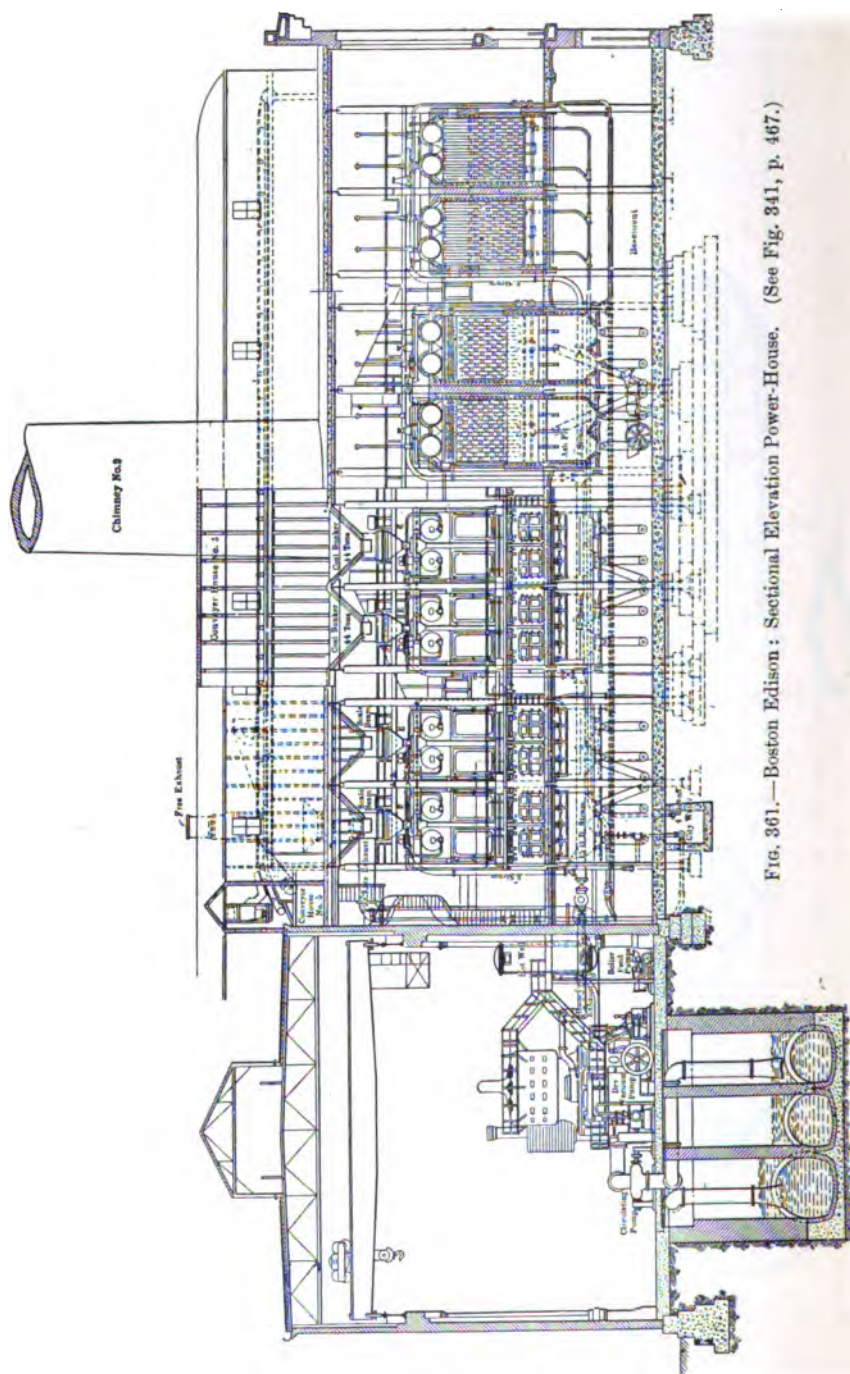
Boston Edison : Sectional Elevation Power-House. (See Fig. 341, p. 467.)
